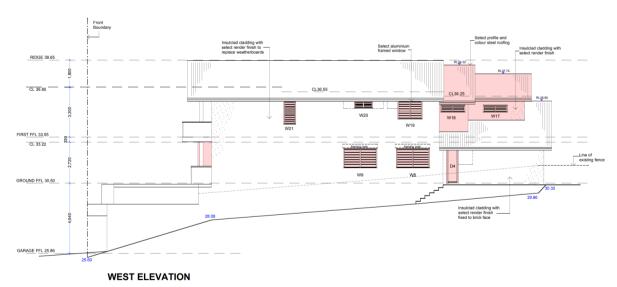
West (Side) Elevation, Sheet No. 8 Dated 19.01.2022
